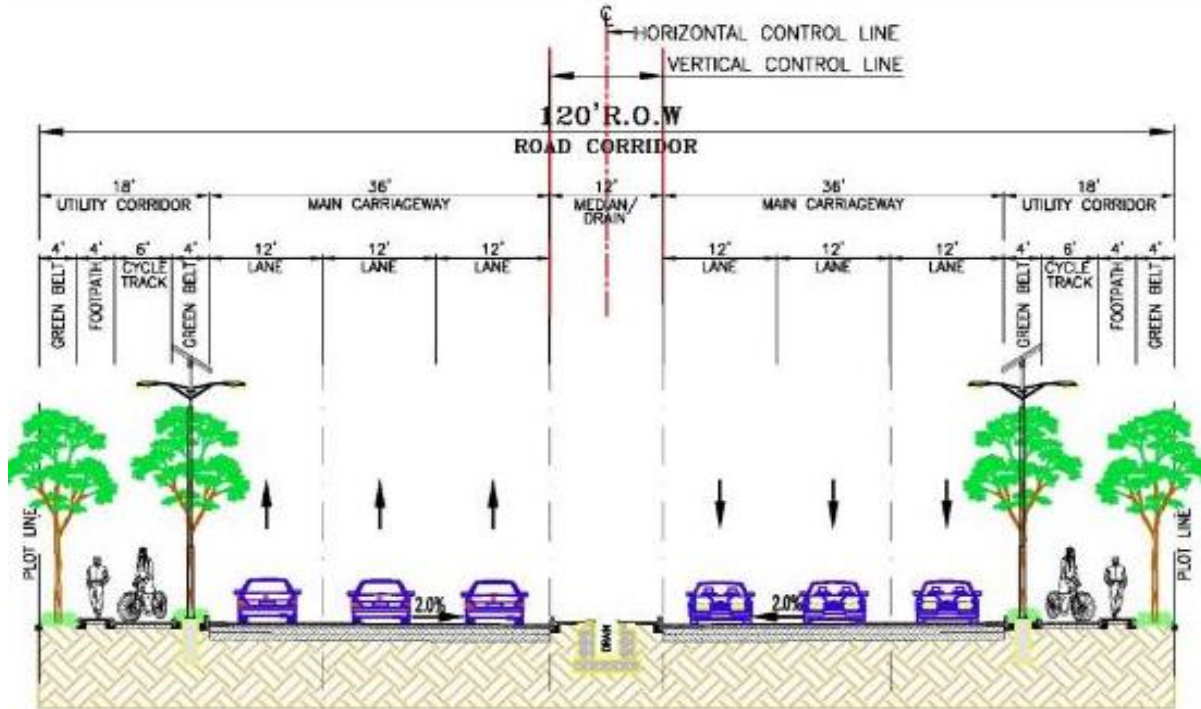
Proposed Cross Section for 120' ROW Faisalabad Bypass
